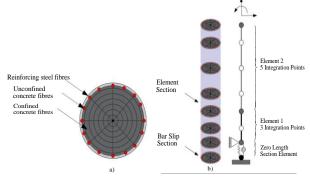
Schematization of fibre beam-column element (a) with the bar buckling and bar slip model (b).
